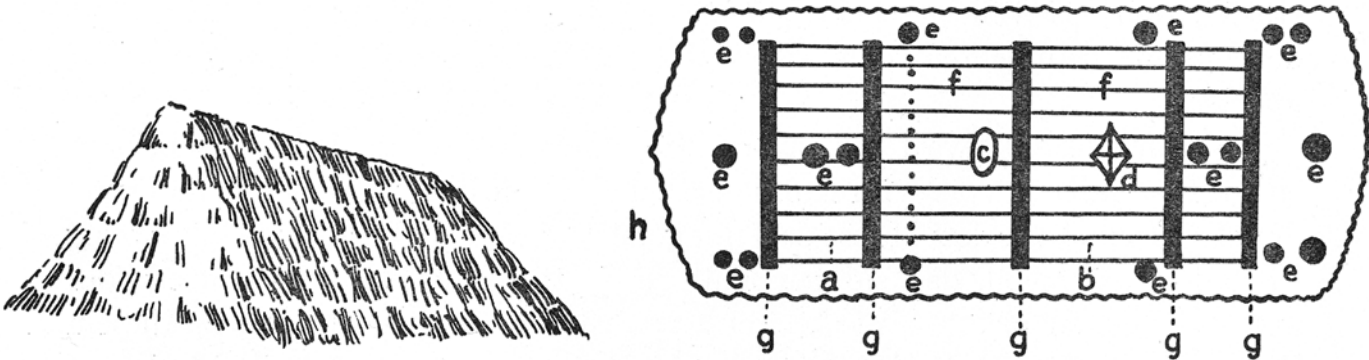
Floor plan of the spirit house *galis* after Hambruch. a) free space b) tabu space c) altar d) spirit boat e) post f) crossbeam on the floor g) lengthwise planks h) house and roof edge.
